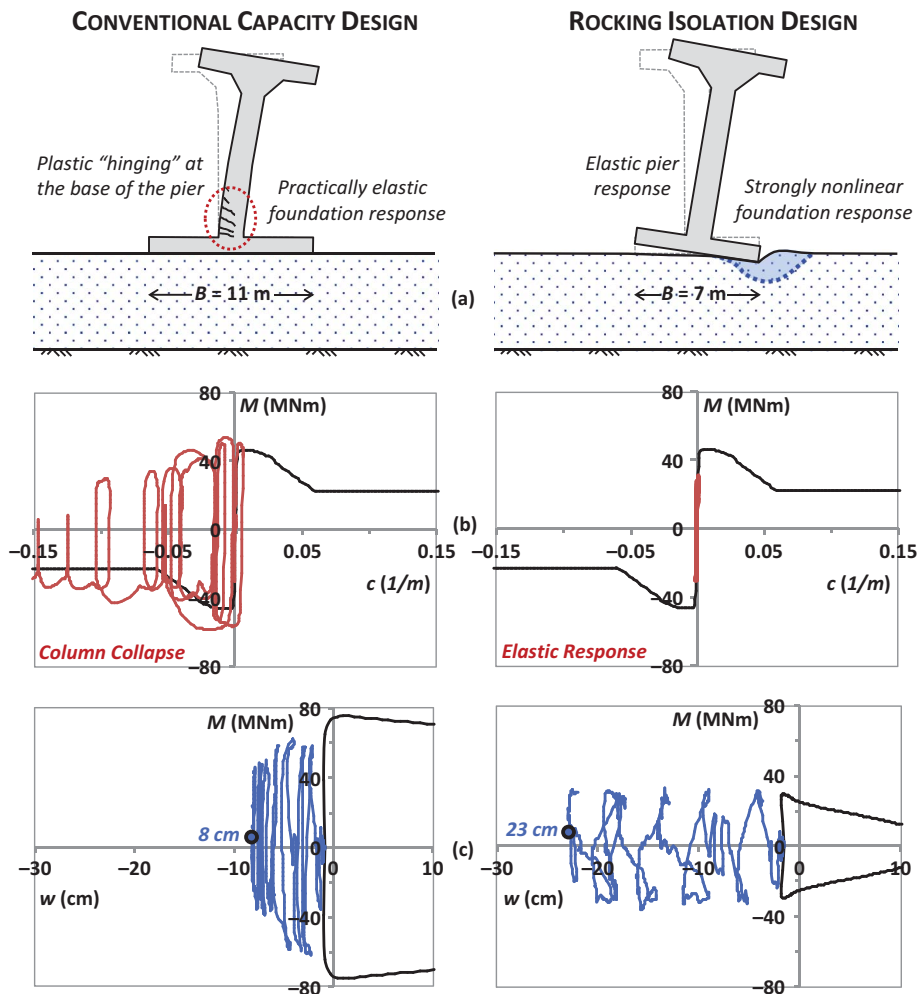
(a) Comparison of conventionally designed bridge pier (left column) with rocking isolation design (right column). Example comparison of the two design alternatives subjected to extreme seismic shaking (Takatori, Kobe 1995) for a typical bridge pier analyzed employing the finite element method [Anastasopoulos *et al.*, 2010]; (b) RC pier moment–curvature response; and (c) foundation moment–settlement response. Note that the backbone curves (black lines) have been deduced from monotonic static pushover analysis (color figure available online).
